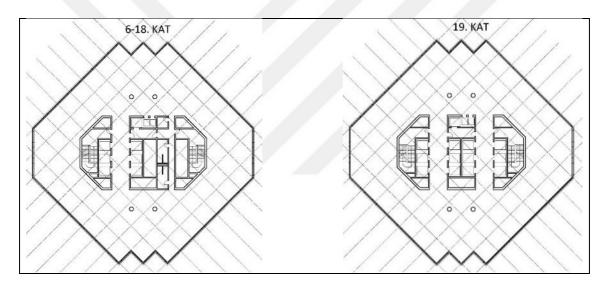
Sixth to nineteenth floor plans of İş Tower
